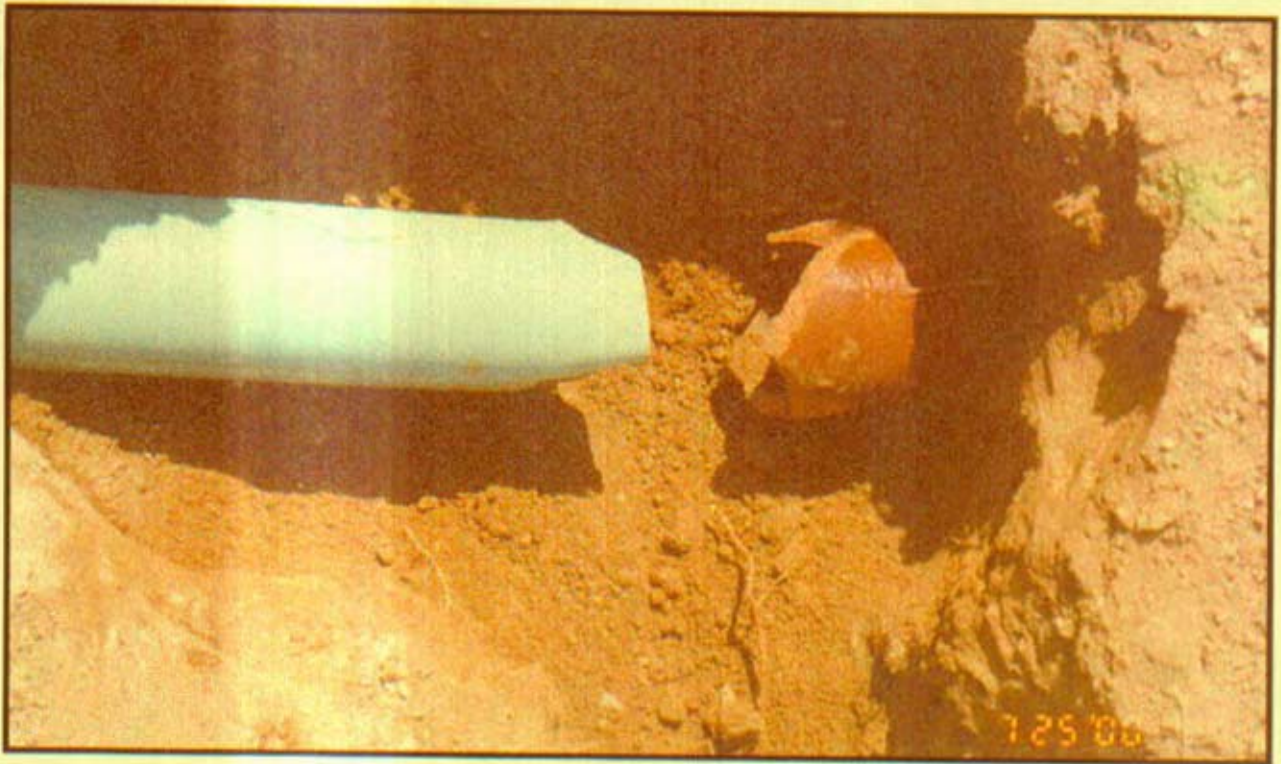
View from the south, looking down at the repair excavation in front of 205 East Oak Street. This is the excavation identified in Photograph 1.
